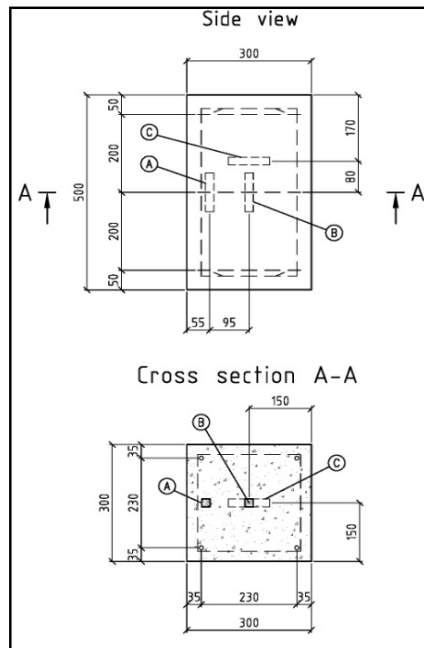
Design of the concrete column with element placement and steel reinforcement
